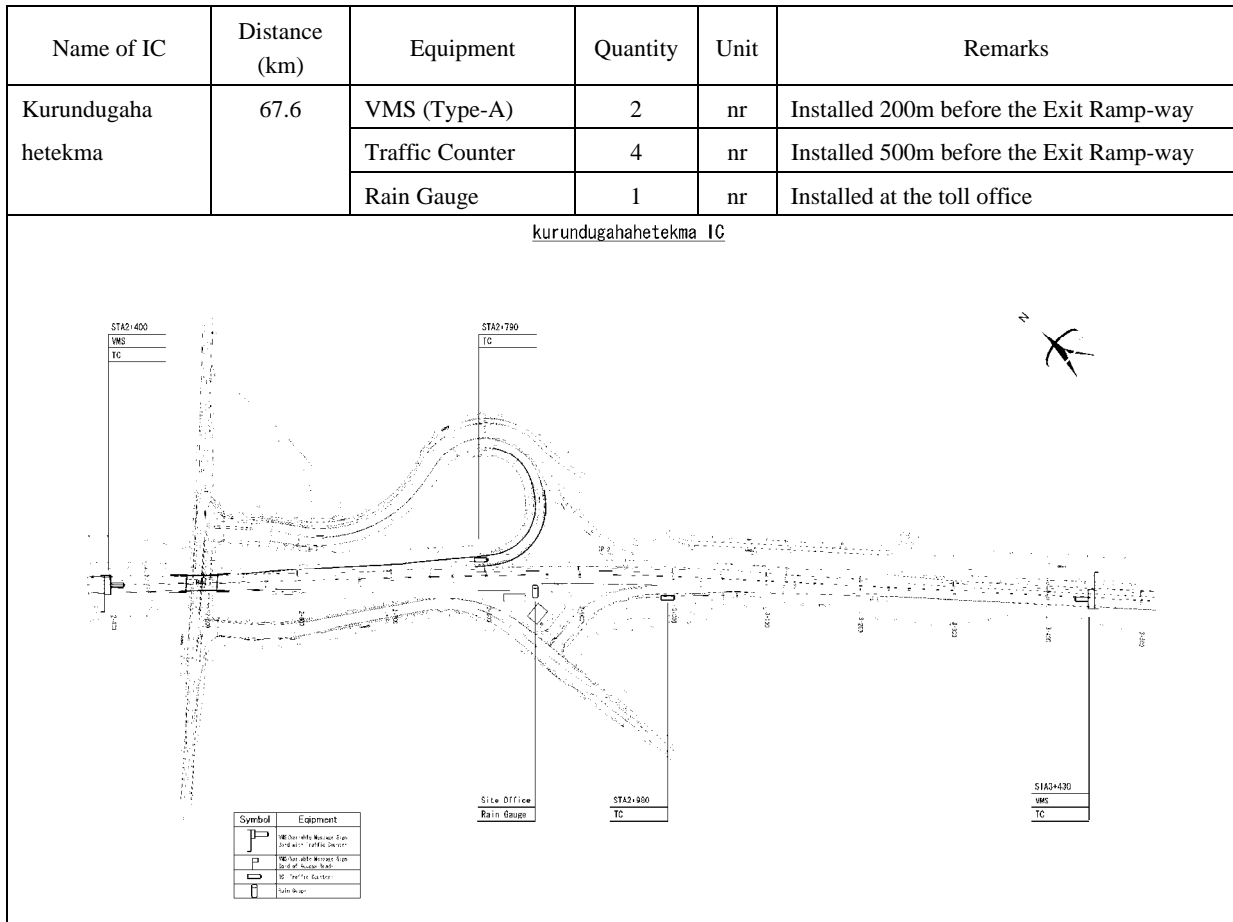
Road side equipment layout plan (Kurundugahahetekma IC)
